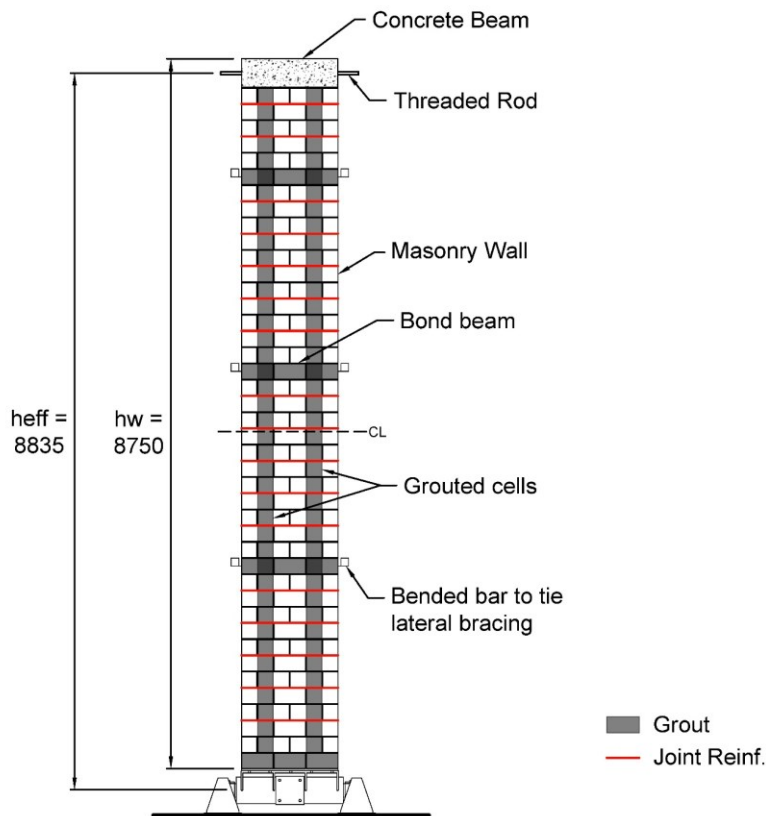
Masonry wall specimen details, front view (dimensions in mm).
